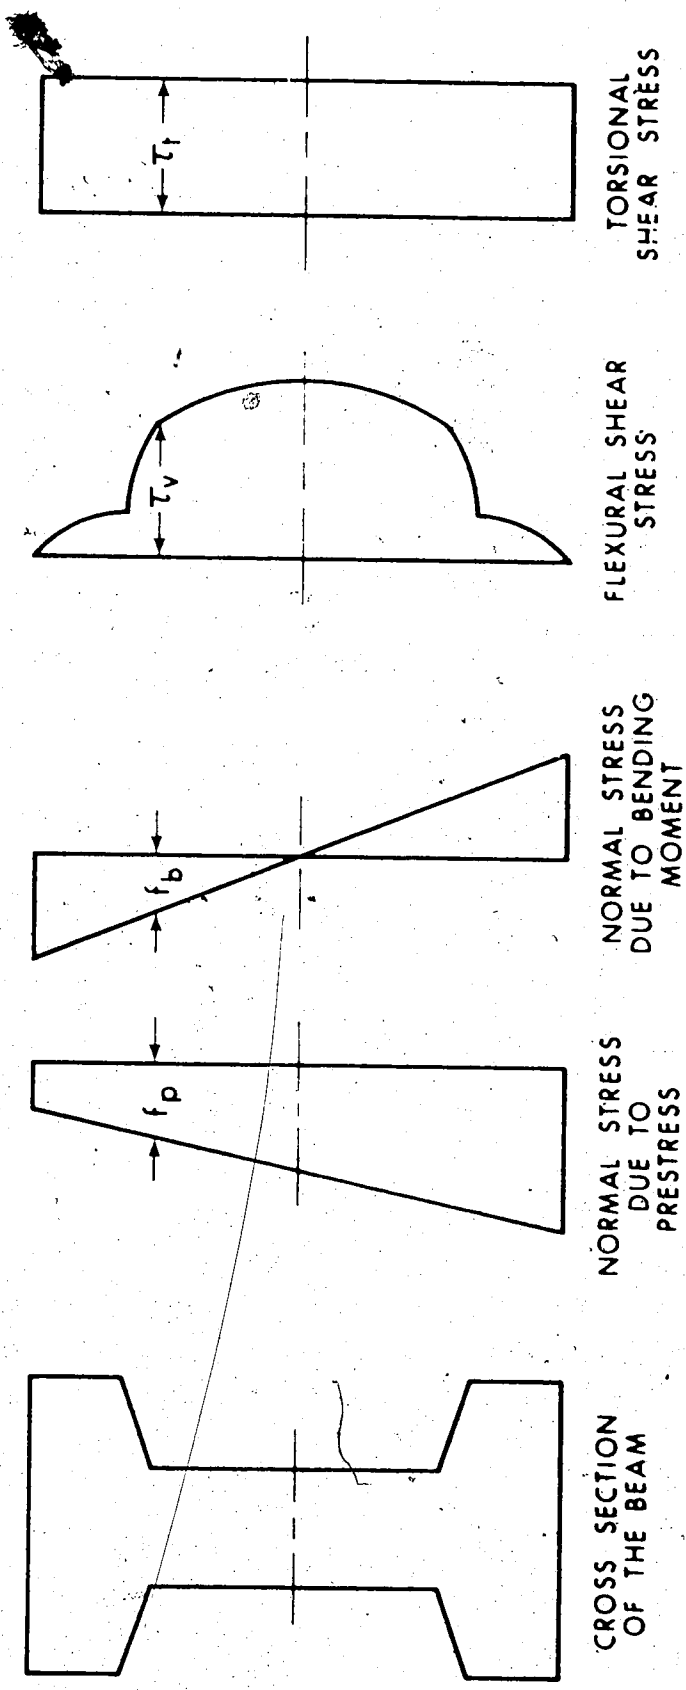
STRESS DISTRIBUTION IN PRESTRESSED CONCRETE SECTION PRIOR TO CRACKING DUE TO VARIOUS FORCES
